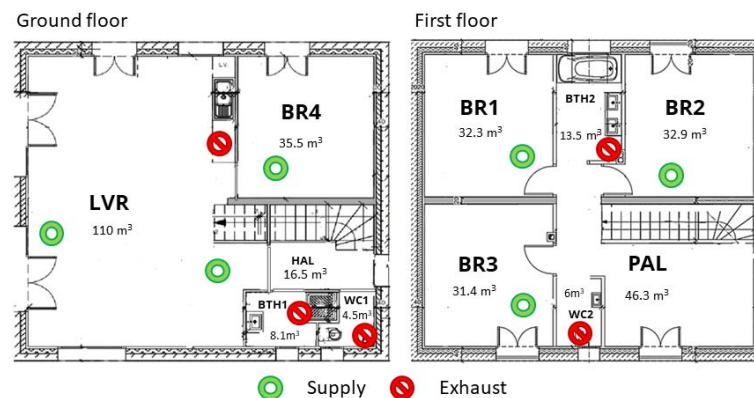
Plan of the case study house; supply and exhaust location for MVHR; exhaust location only for MEV
